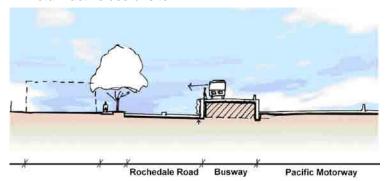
Typical cross-section through Precinct 2 — Strategy 1
